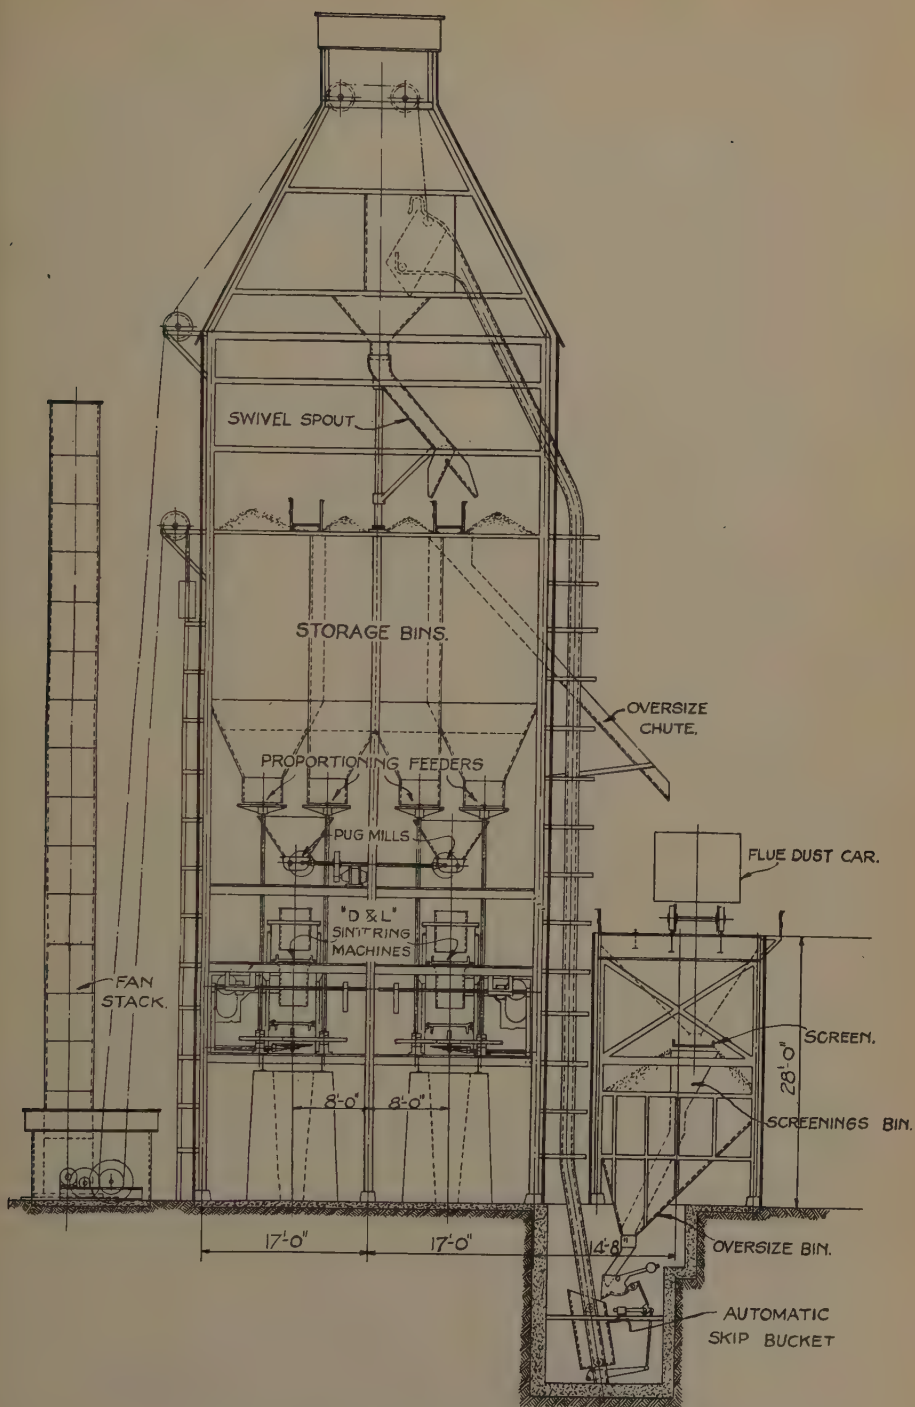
Dwight and Lloyd sintering plant with elevated storage bins and automatic skip hoist.
